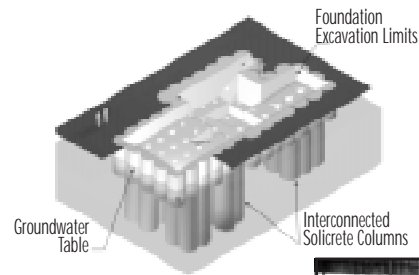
The Soil mixing process stabilized the soil mass below the granite saw foundation, creating a “bathtub” barrier around the irregularly shaped excavation.
